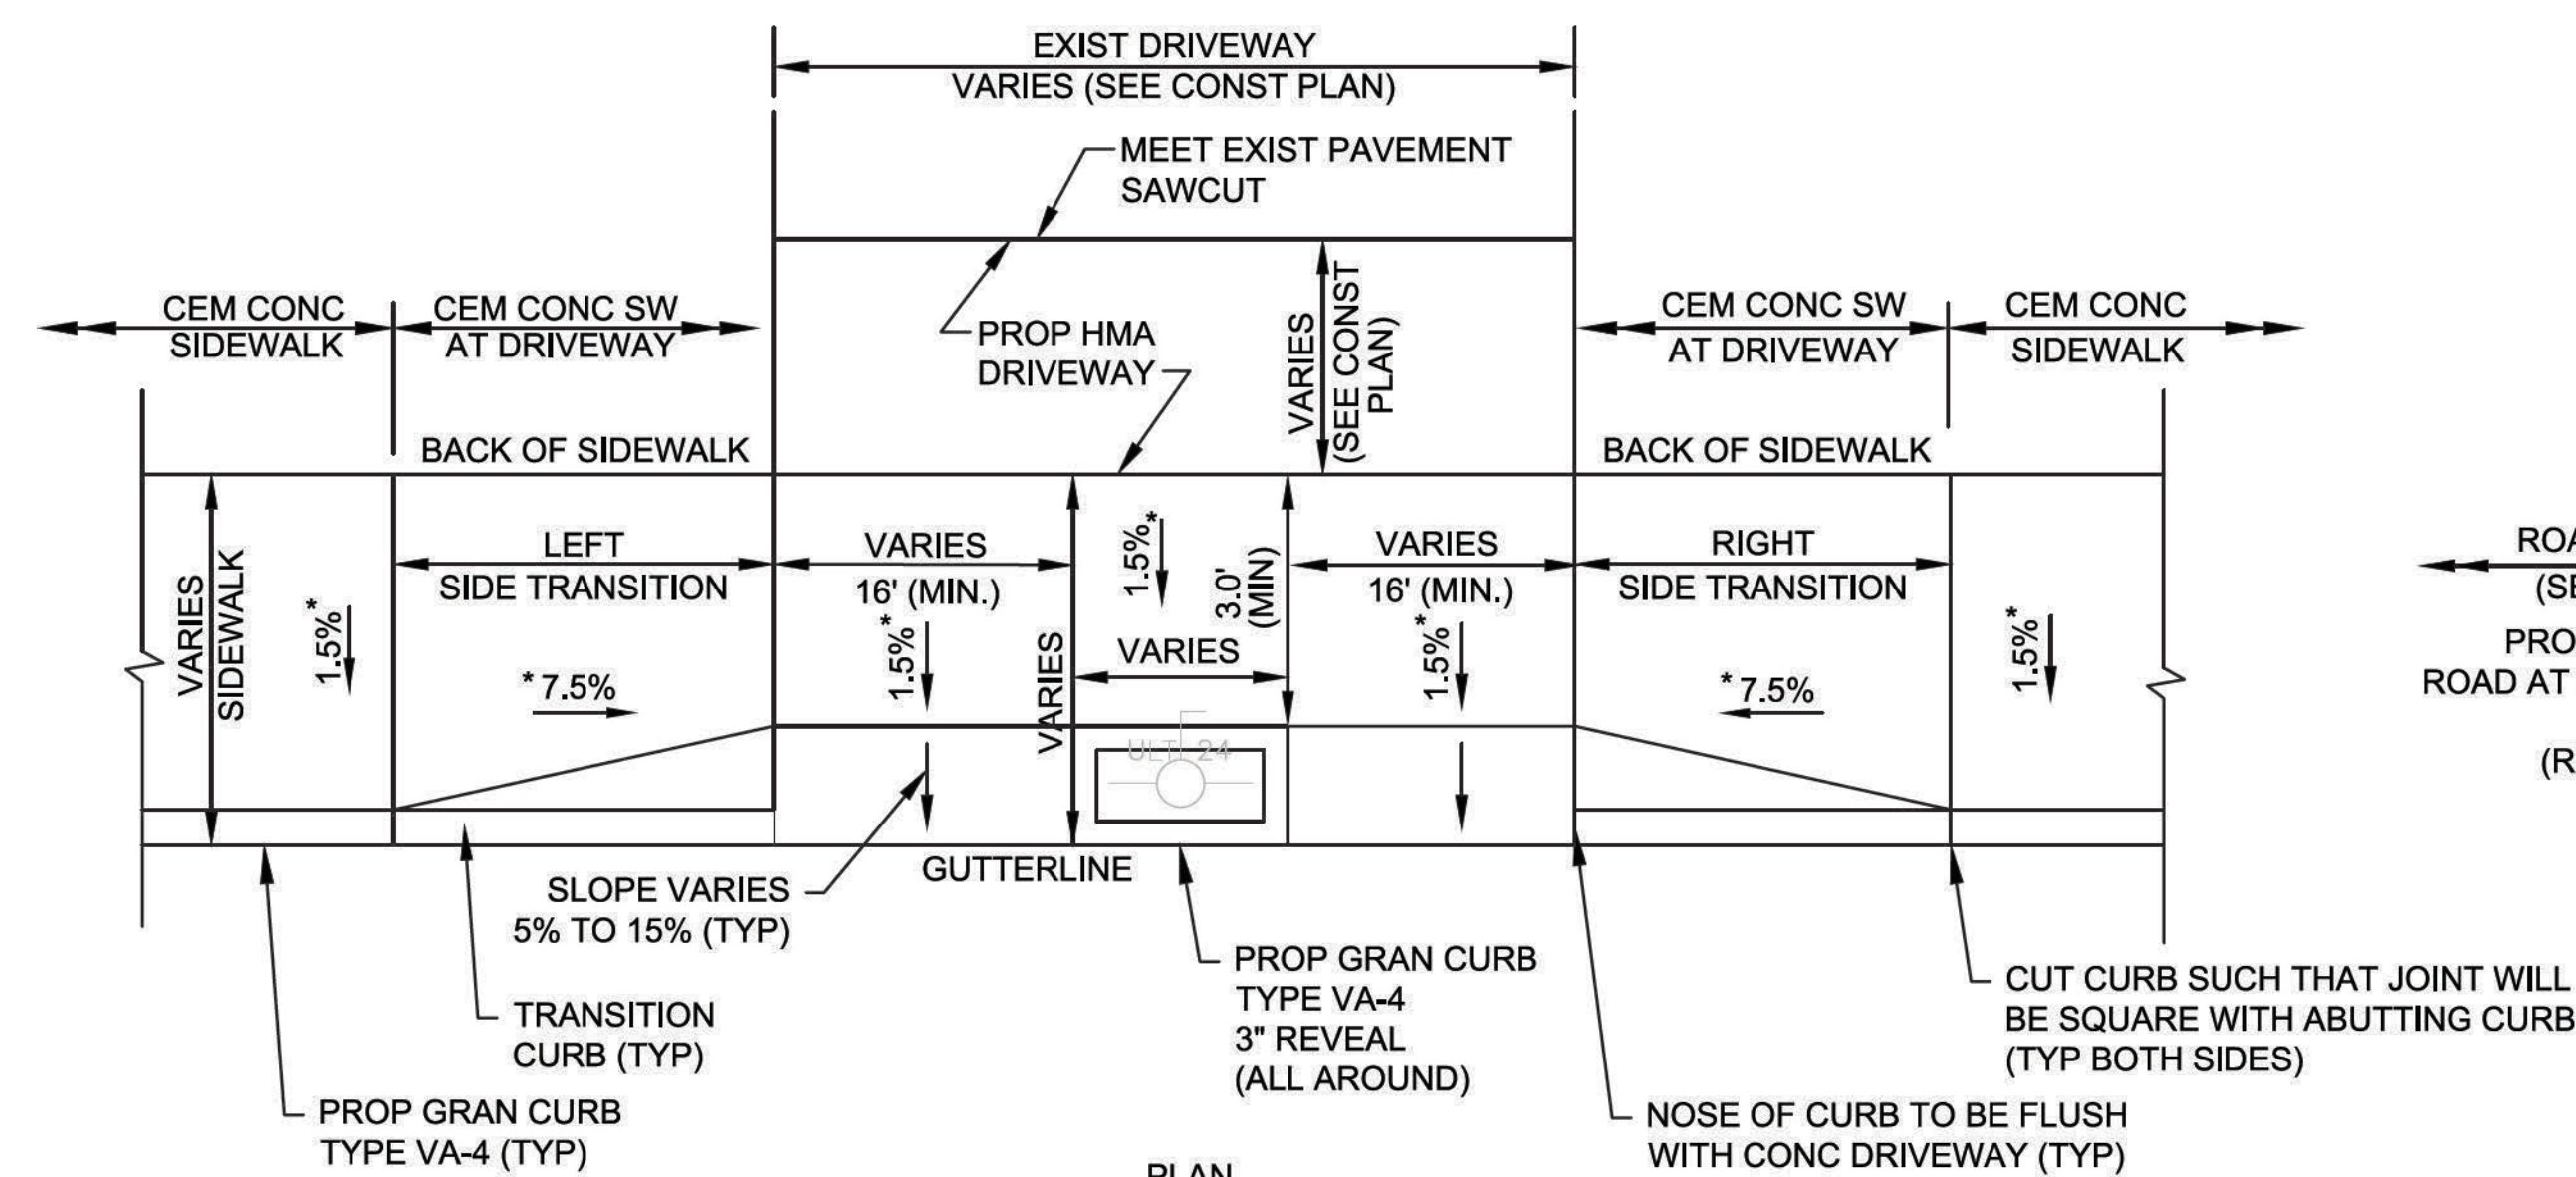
DETAIL FOR DEPRESSED DRIVEWAY WITH SIDEWALK - TYPE B
